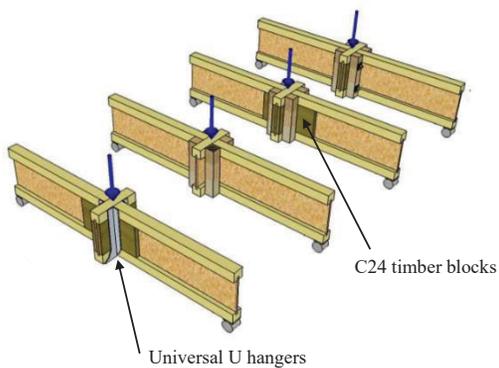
Typical blocking systems reinforced with steel hangers and timber wood blocks
